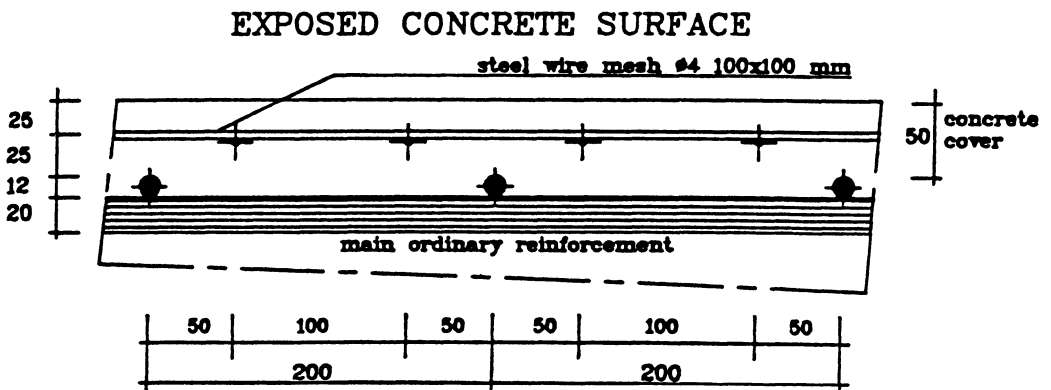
Detail of surface reinforcement in aggressive environment with high concrete cover.
